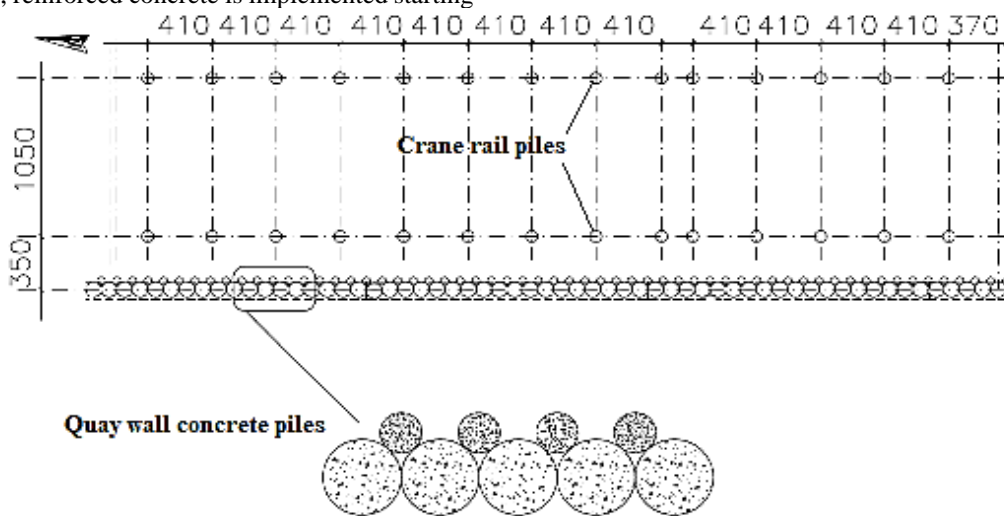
Bandar-e-Anzali port's contiguous piles quay wall plan view
